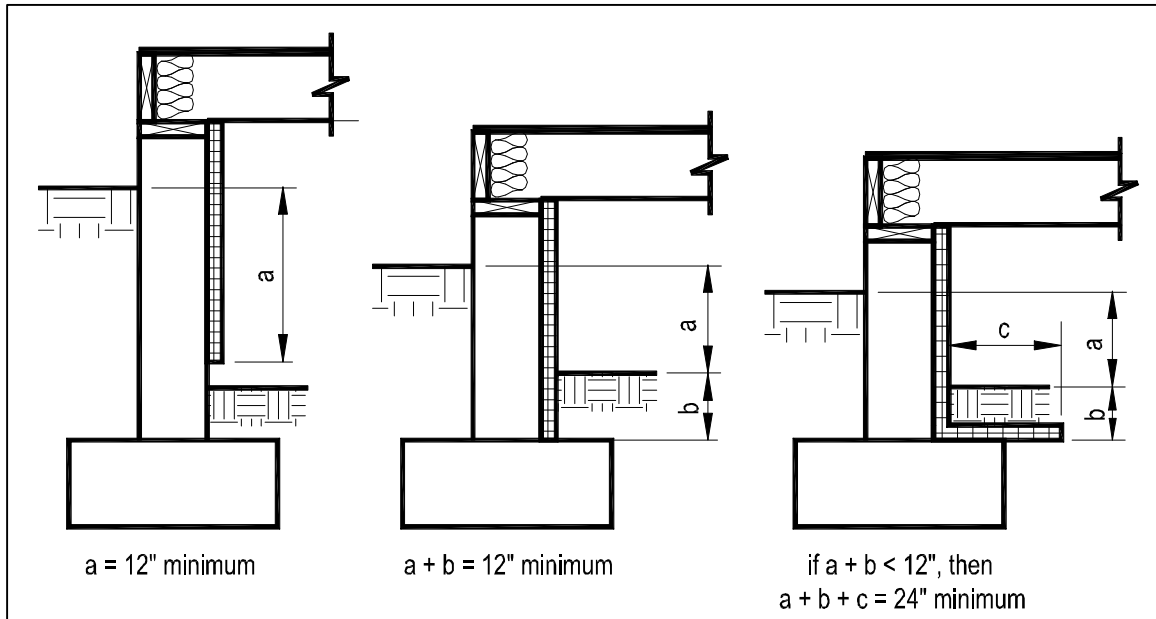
CRAWL SPACE WALL INSULATION REQUIREMENTS
